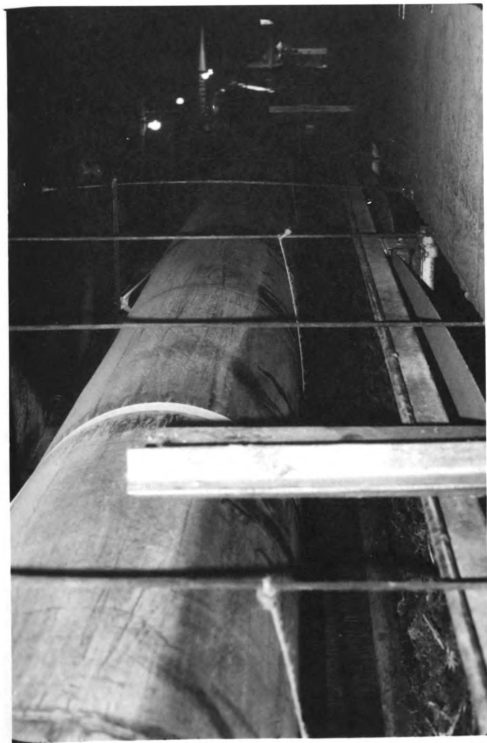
View of perforated tube system showing clearance for exhausted ventilation air from the poultry house.
